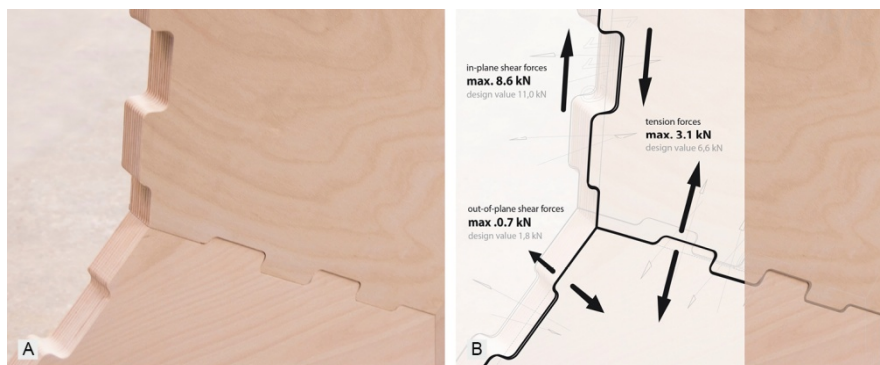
Visualization of the forces inside the plate structure. The dominant in-plane shear forces are transferred through the plate's finger joints.
